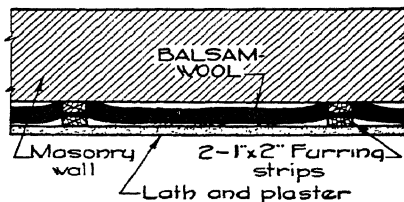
Method of Applying Blanket Insulation to Brick Wall
